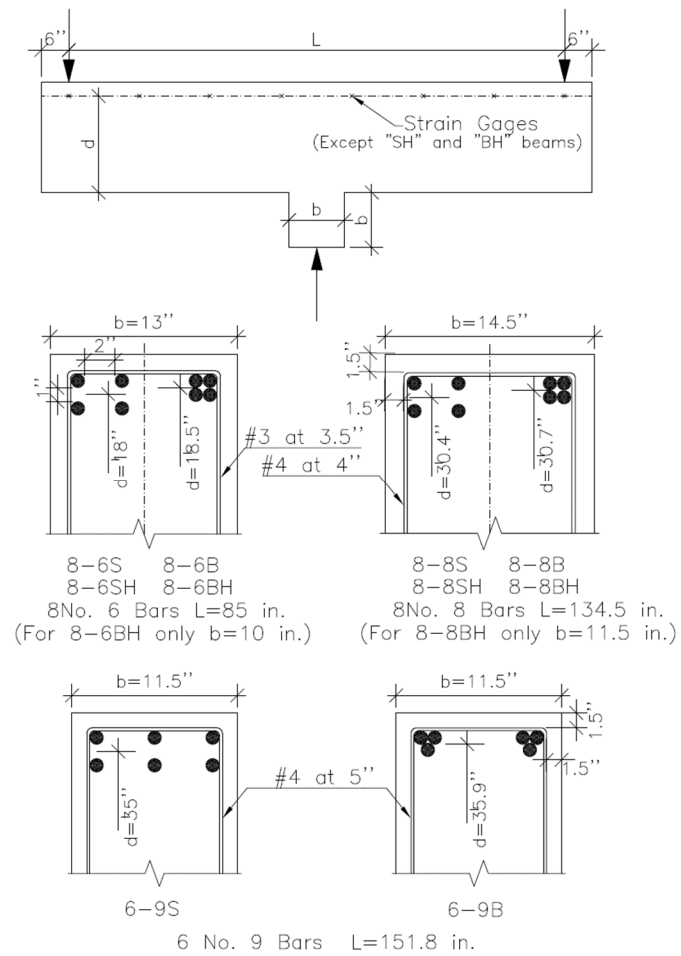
Beam sections, reinforcement and loading details (redraw) (Hanson and Reifensuhl 1958)
